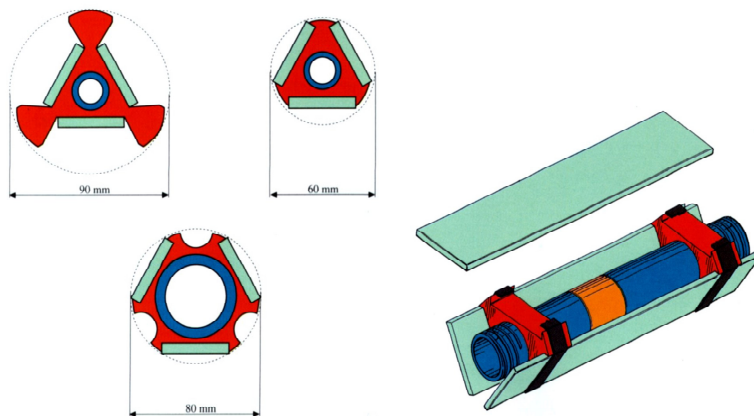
Flat fiber-glass structural elements adopted for face reinforcement in the full-face excavation/construction method.
